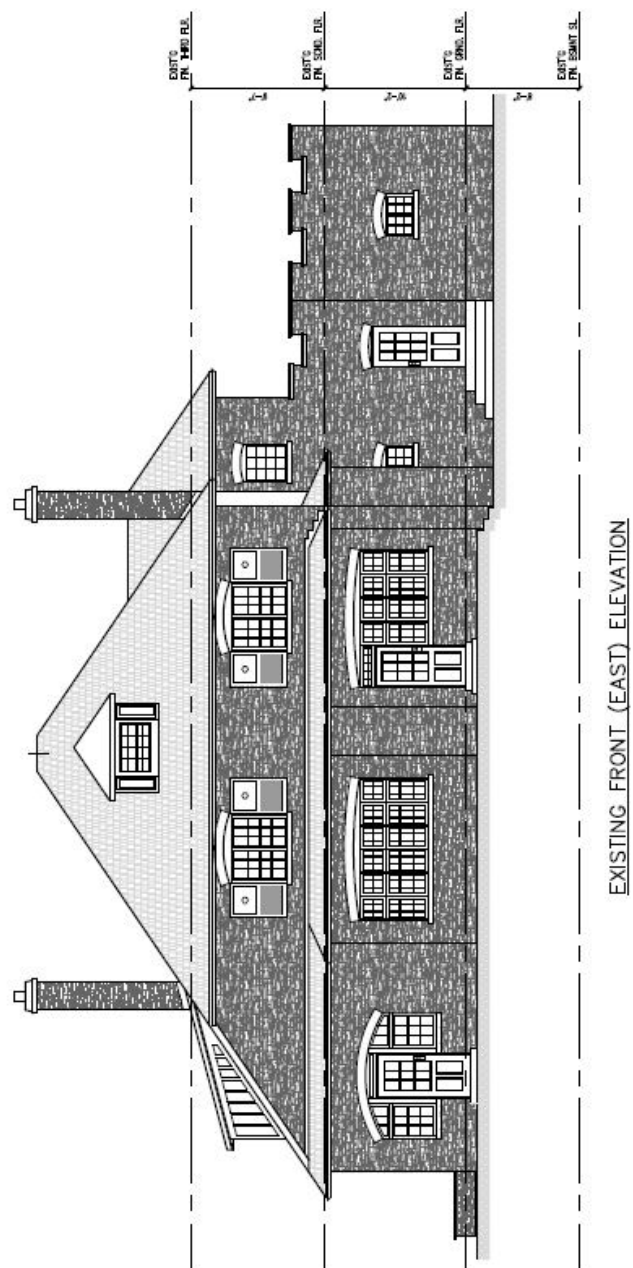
The front or east elevation of 1341 Stavebank Road as it exists in 2020. (Image from owners.)
